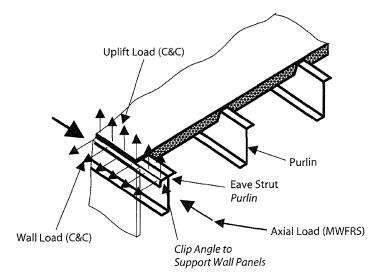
B Eave Strut Purlin Supports Roof and Wall Panels
